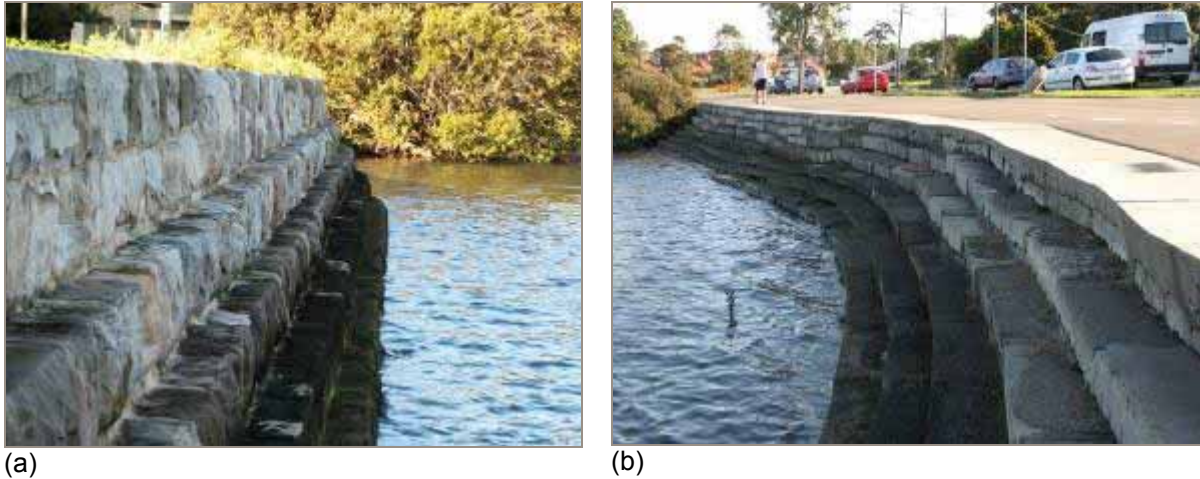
(a) Stepped sandstone and (b) concrete block revetments
